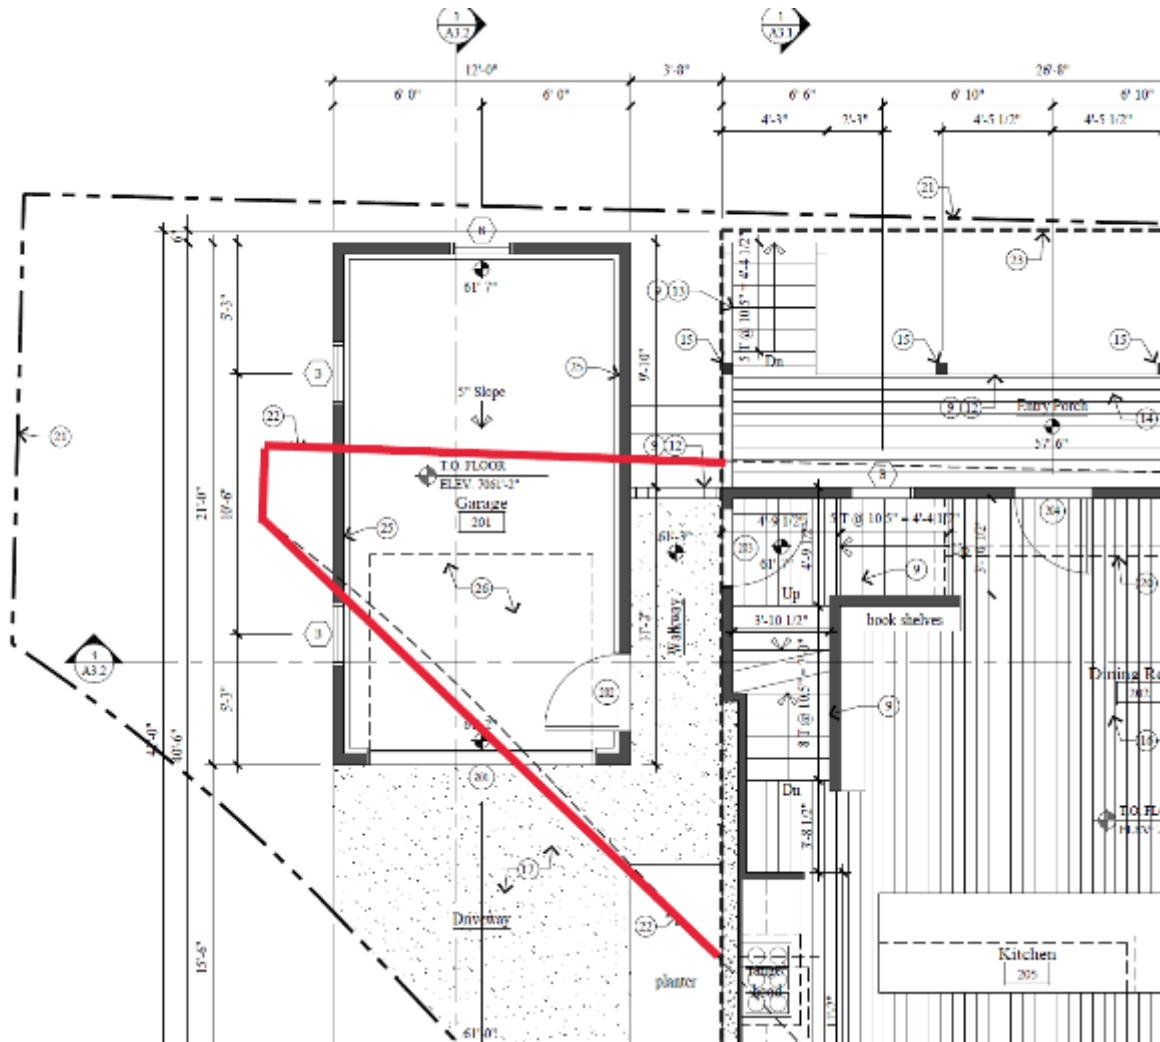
844 Empire Avenue plans showing Accessory Building encroaching into front setbacks, shown in red. (Exhibit B, Applicant's Submittal).
